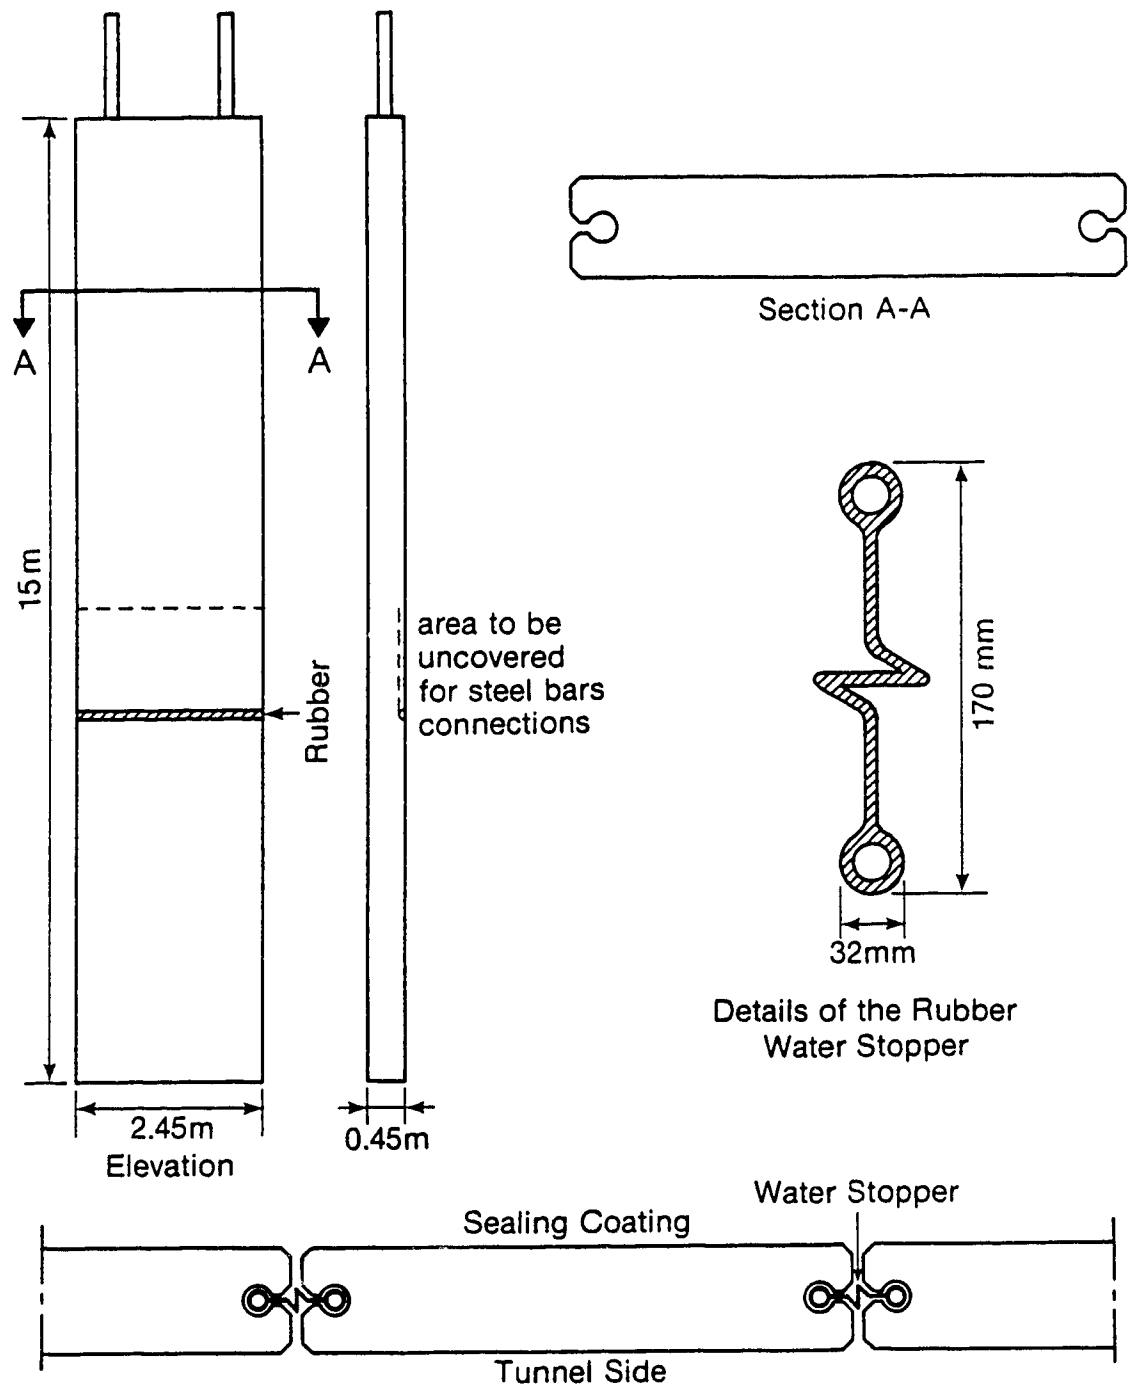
Details of the Pre-Cast Diaphragm Wall Used for the Running Tunnel Test Section
